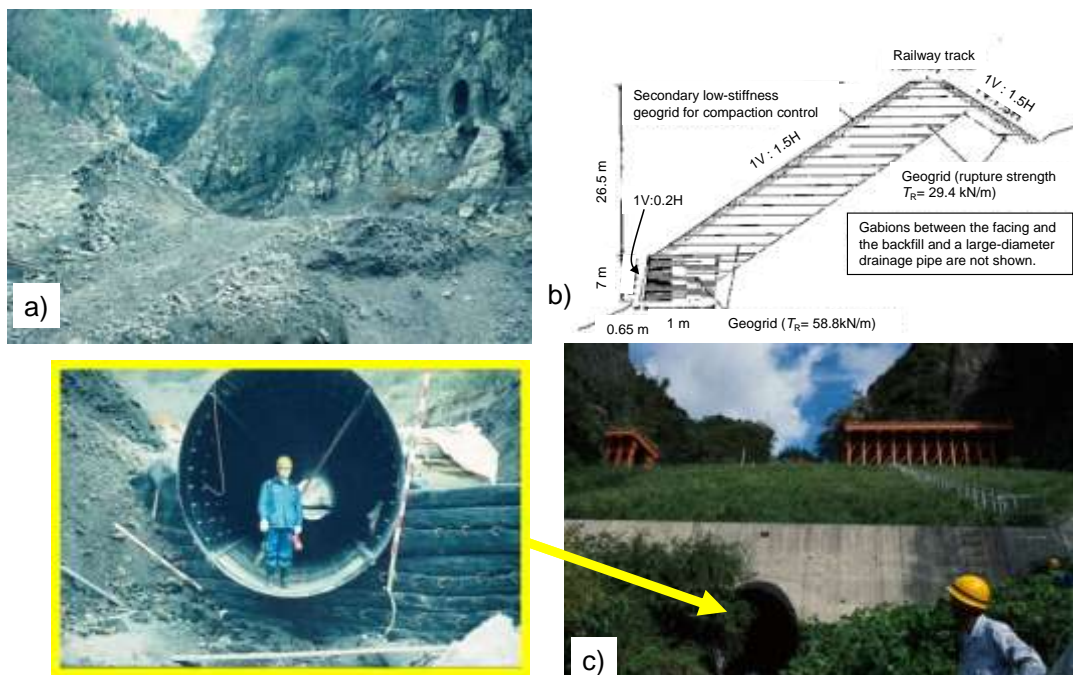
Typical section of a railway embankment damaged by rainfall in 1989 and reconstructed in 1991: a) before reconstruction; b) reconstructed cross-section; and c) after reconstruction (Tatsuoka et al., 1997a; 2007).
